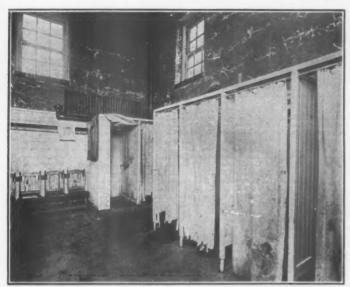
TYPICAL SHOWER-ROOM WITH WOOD STALLS, RUBBER CURTAINS, AND WALLS PAINTED WITH ORDINARY PAINT
